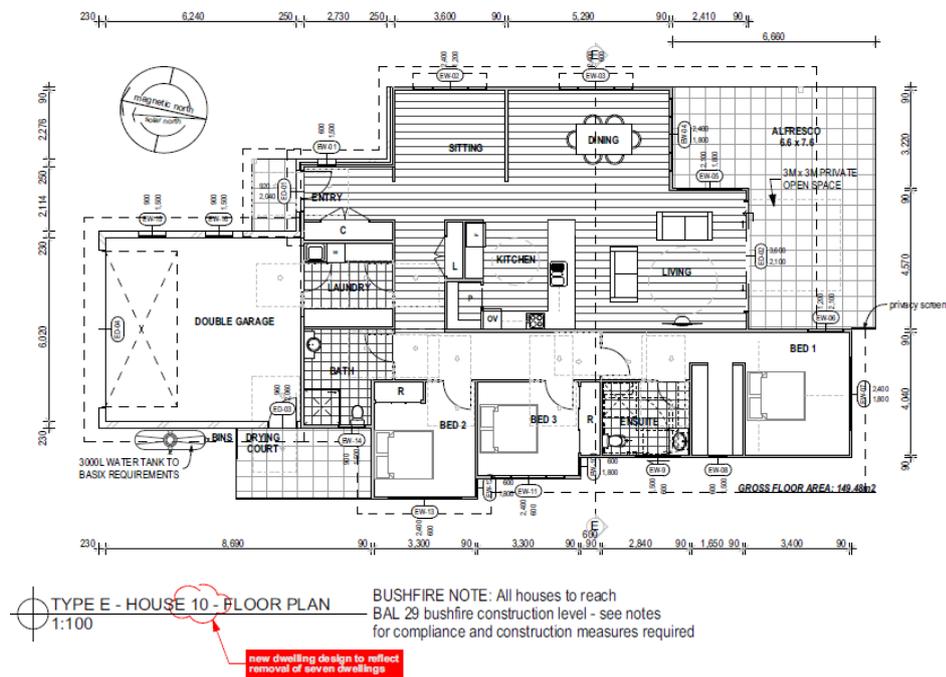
Proposed Housing Type E Floor Plan (Dwelling 10)
